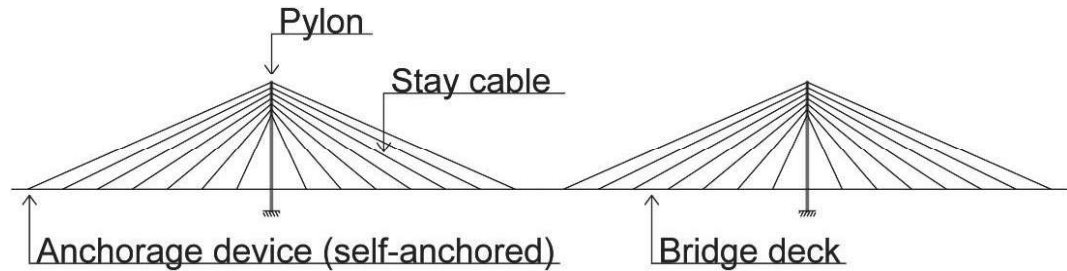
The typical design of a cable-stayed bridge and its main structural elements
